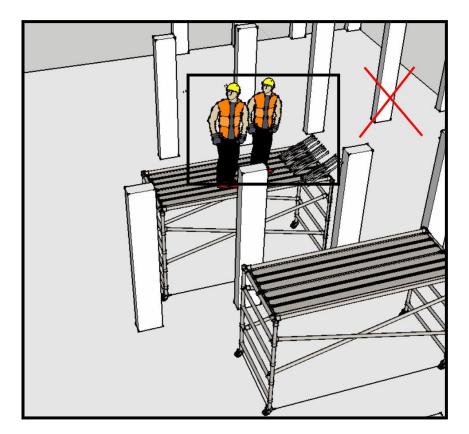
Shows two workers on the scaffold along with heavy equipment where the floor base is over loaded
